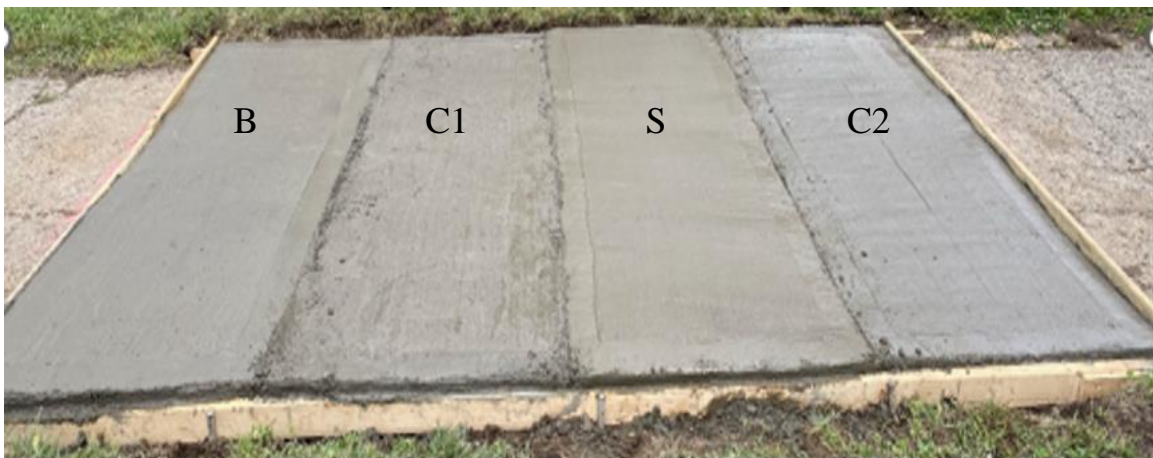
Installed concrete slabs. B: Concrete with *B. subtilis* bacteria, C1: control mixture concrete, cured using the same methods as the bacterial slabs, S: concrete with soil bacteria, C2: control concrete, no curing solution applied.
